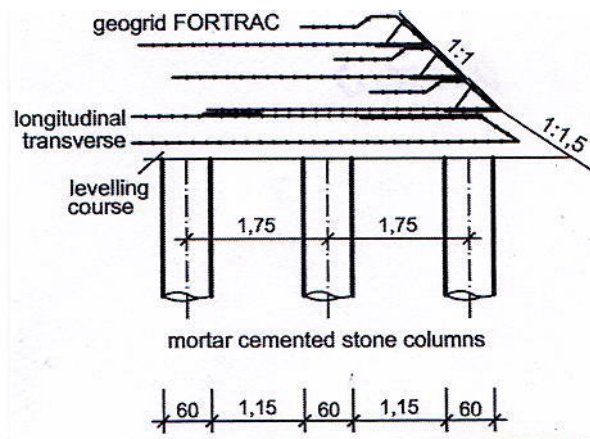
Geogrid reinforcement of embankment on the mortar-cemented stone columns (from toe to toe over the entire embankment base, not shown)
